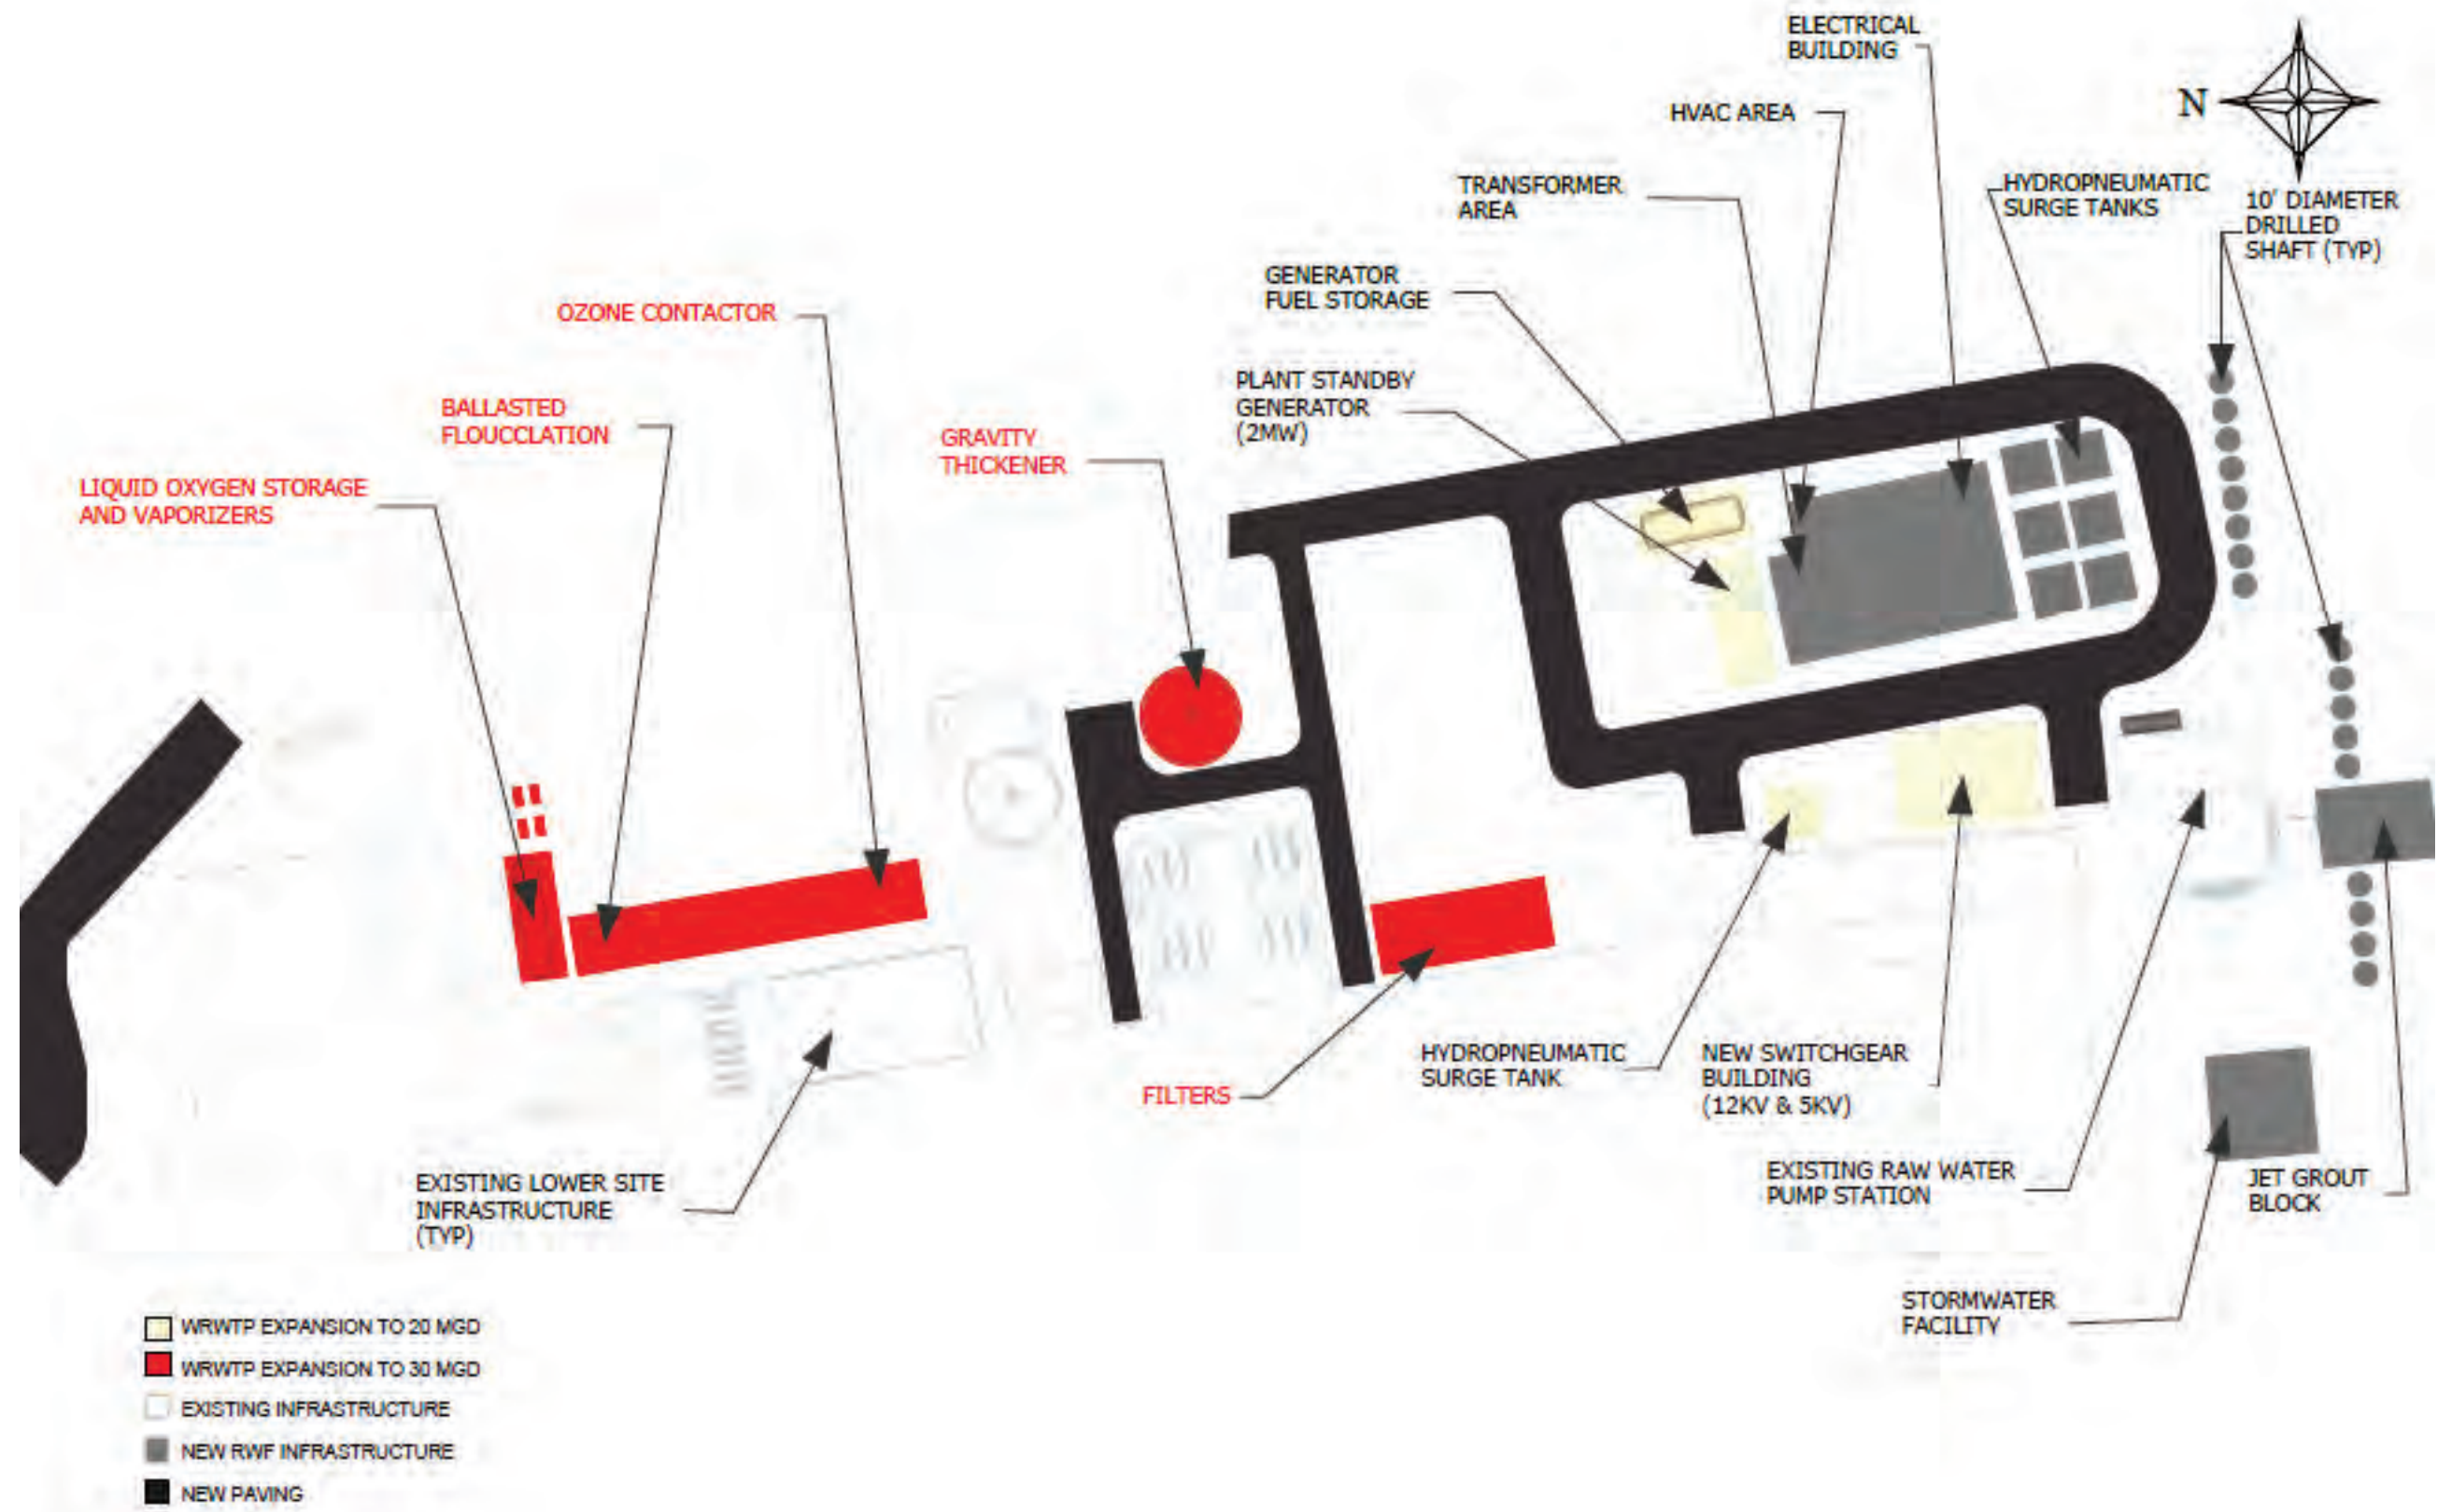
WRWTP Site Layout – 30 mgd Design Capacity
